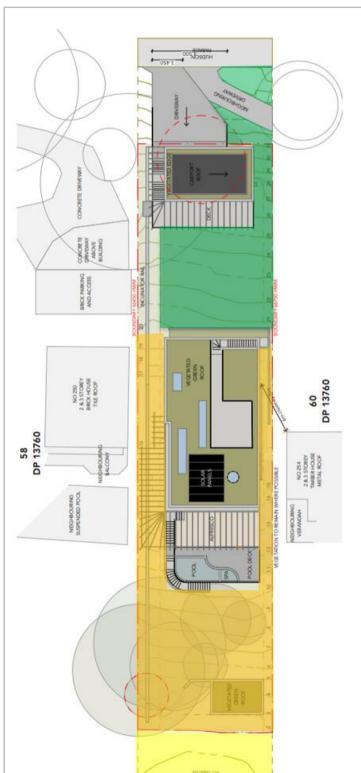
Screening to be planted on west boundary by way of small trees. 1st Row 1 m spacing and 2nd Row of large shrubs at alternative 1 m spacing. Screening from Pittwater will be provided from native plantings as proposed in this plan and the existing trees.
